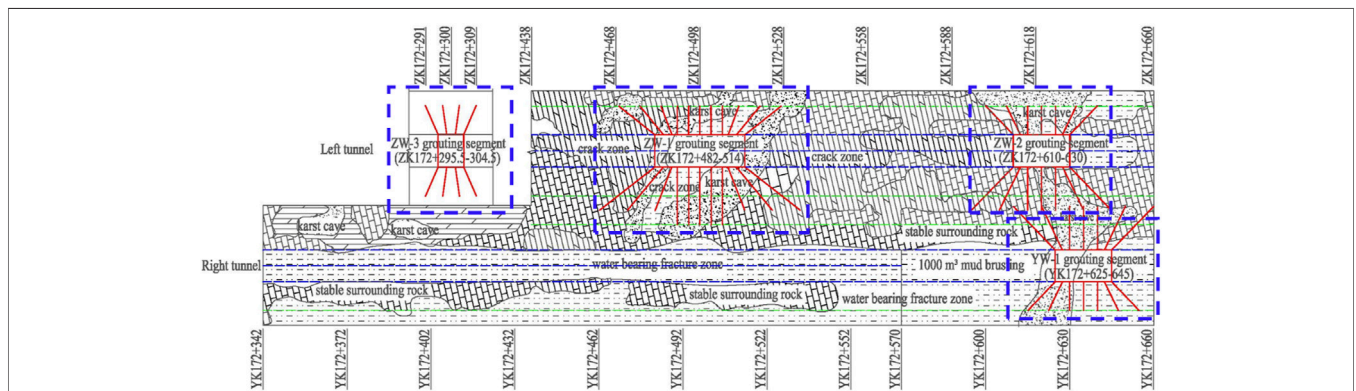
| Plane layout of the curtain grouting of the surrounding rock.
